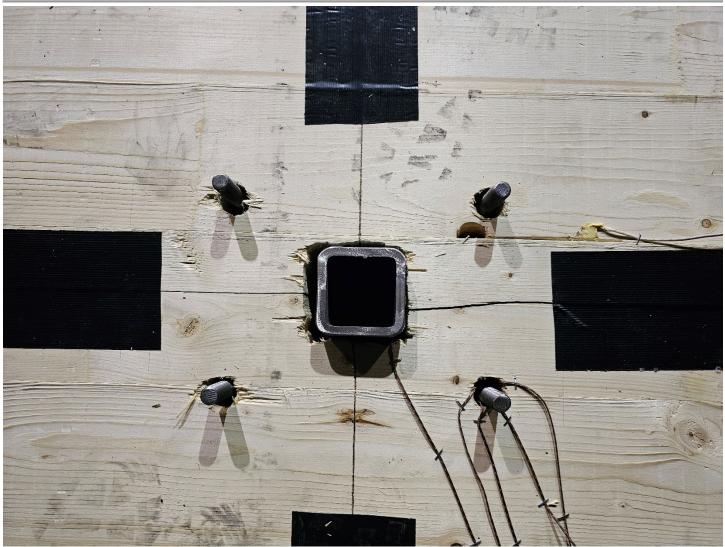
CLT panel joints and steel column w prior to steel plate and gypsum installation.
